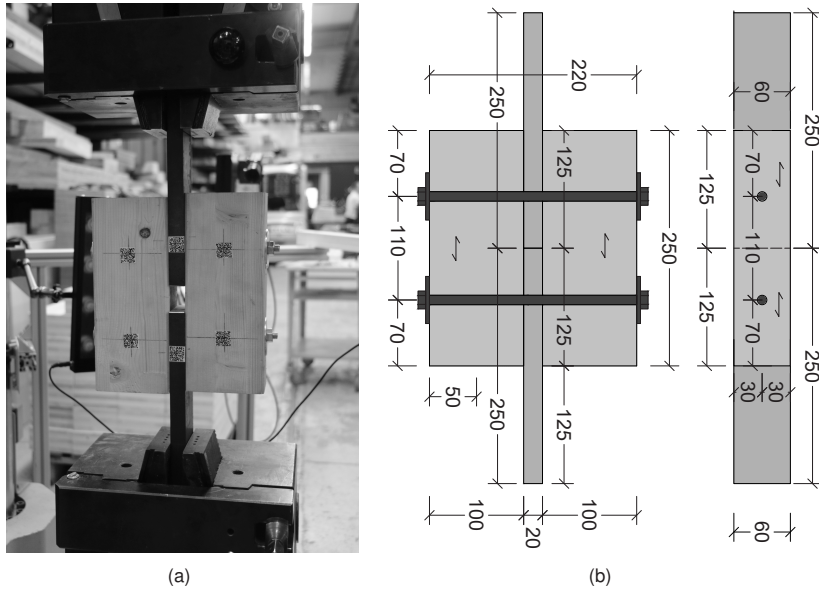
Test setup for tests with perpendicular bolts (a) and measurements of test specimens (b).
